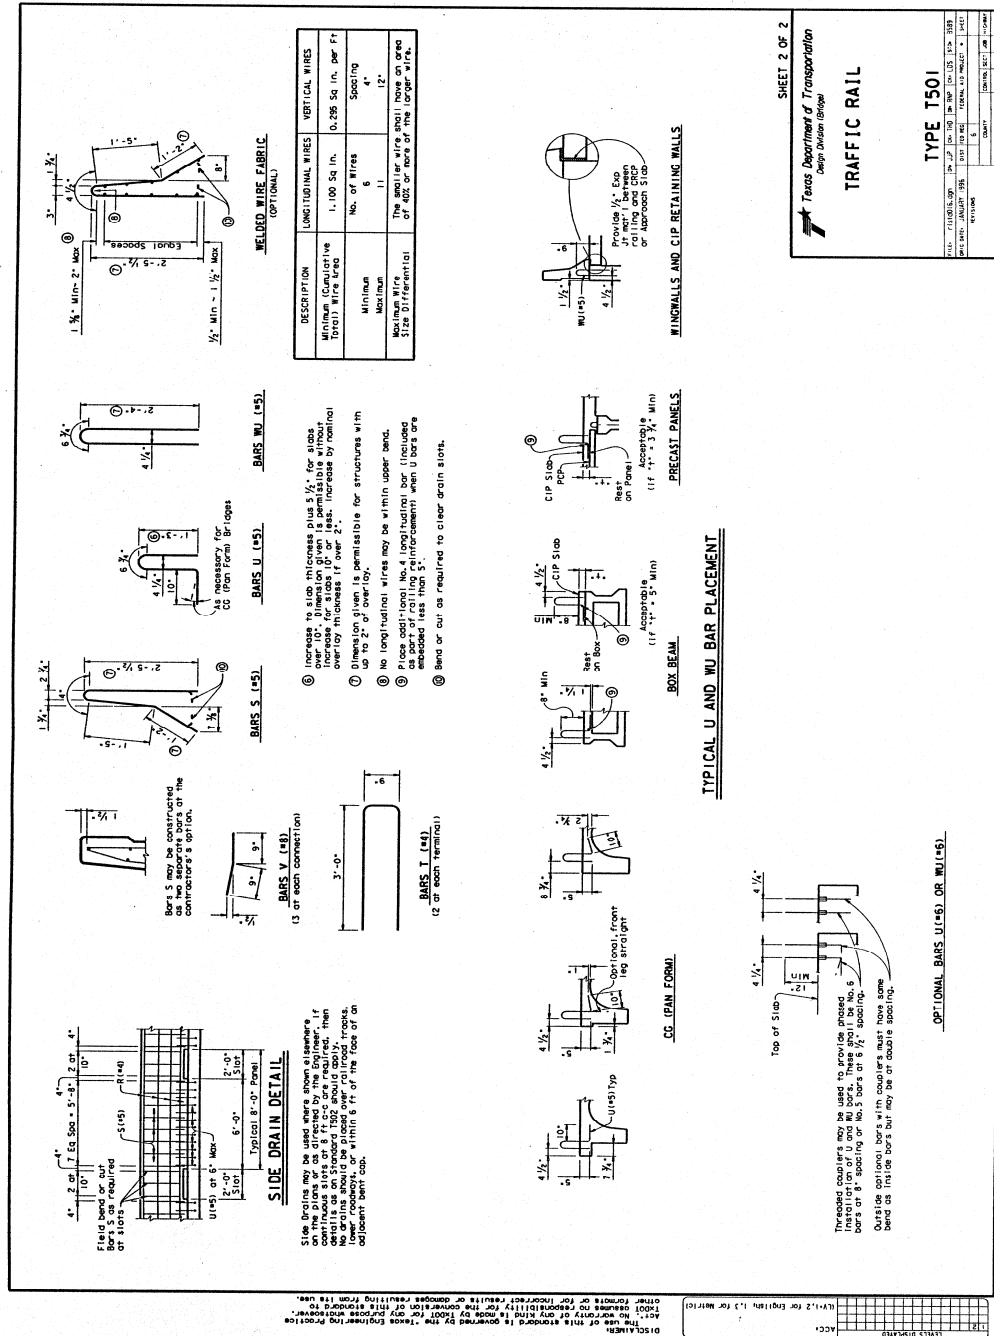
TxDOT T501 Traffic Rail Construction Drawings (Sheet 2 of 2)
